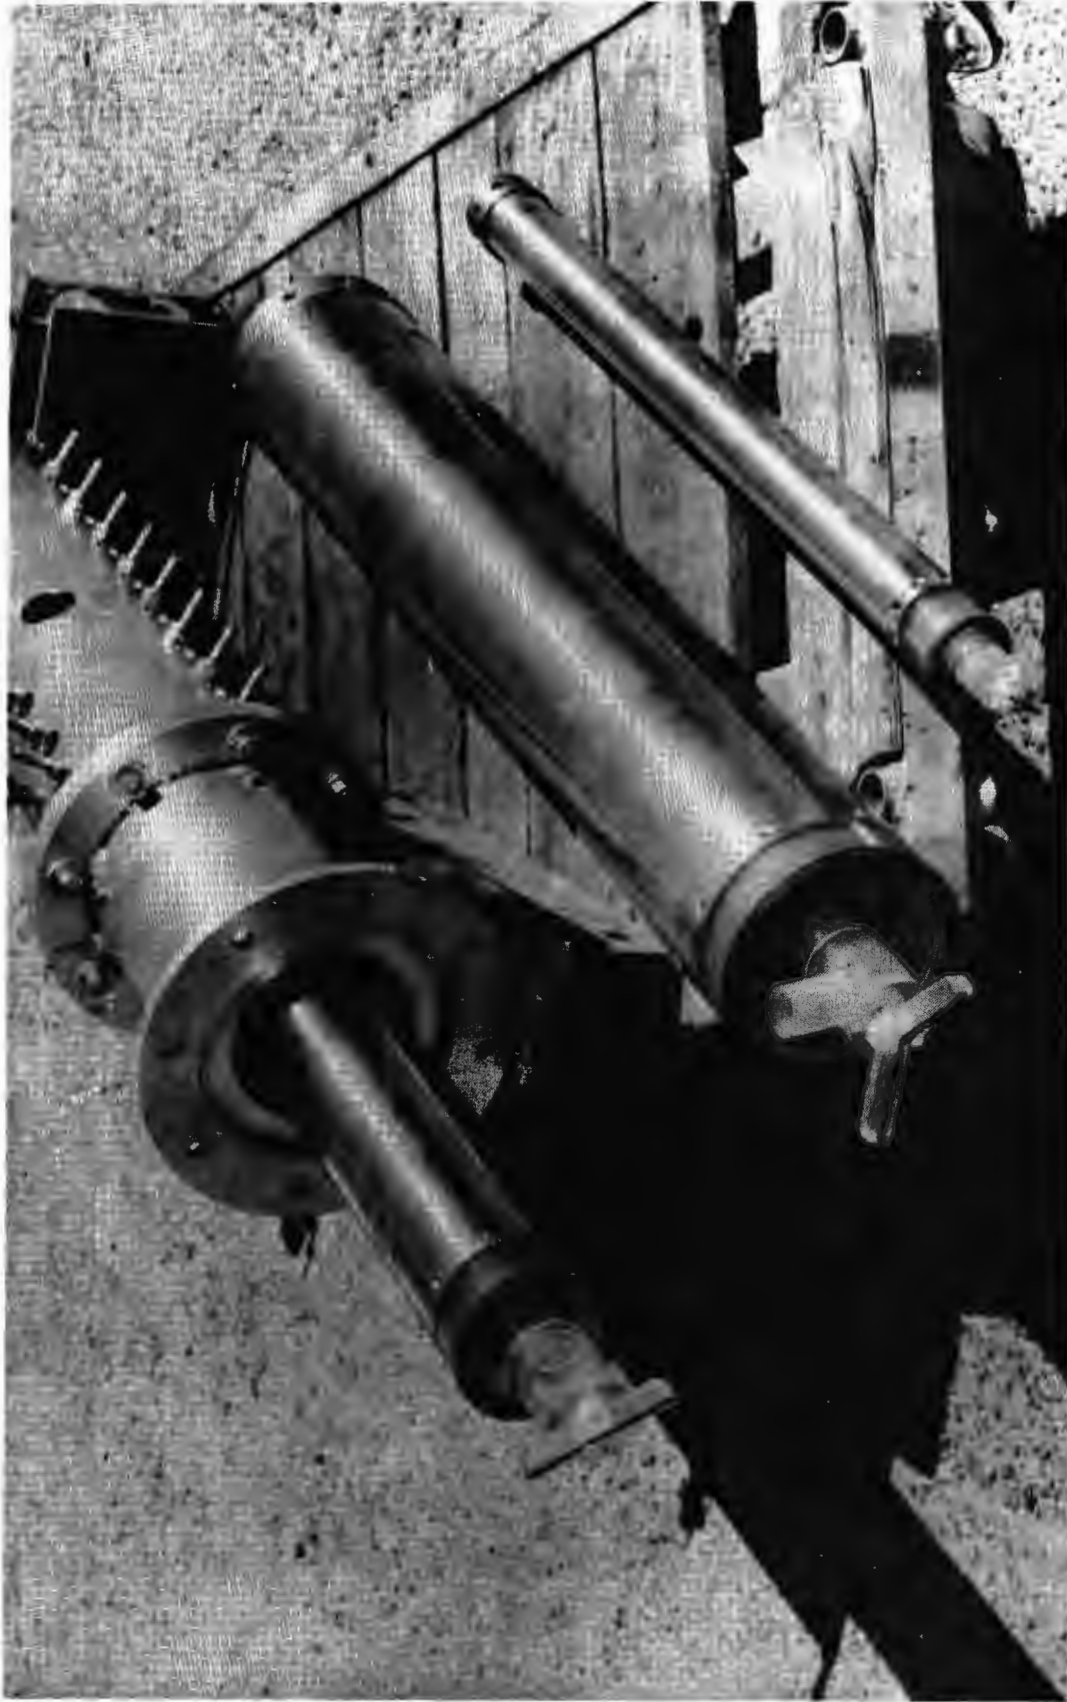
EXCAVATION END, SHOWING CUTTING HEAD, OF THE THREE TUNNEL LINERS USED IN STUDY.
